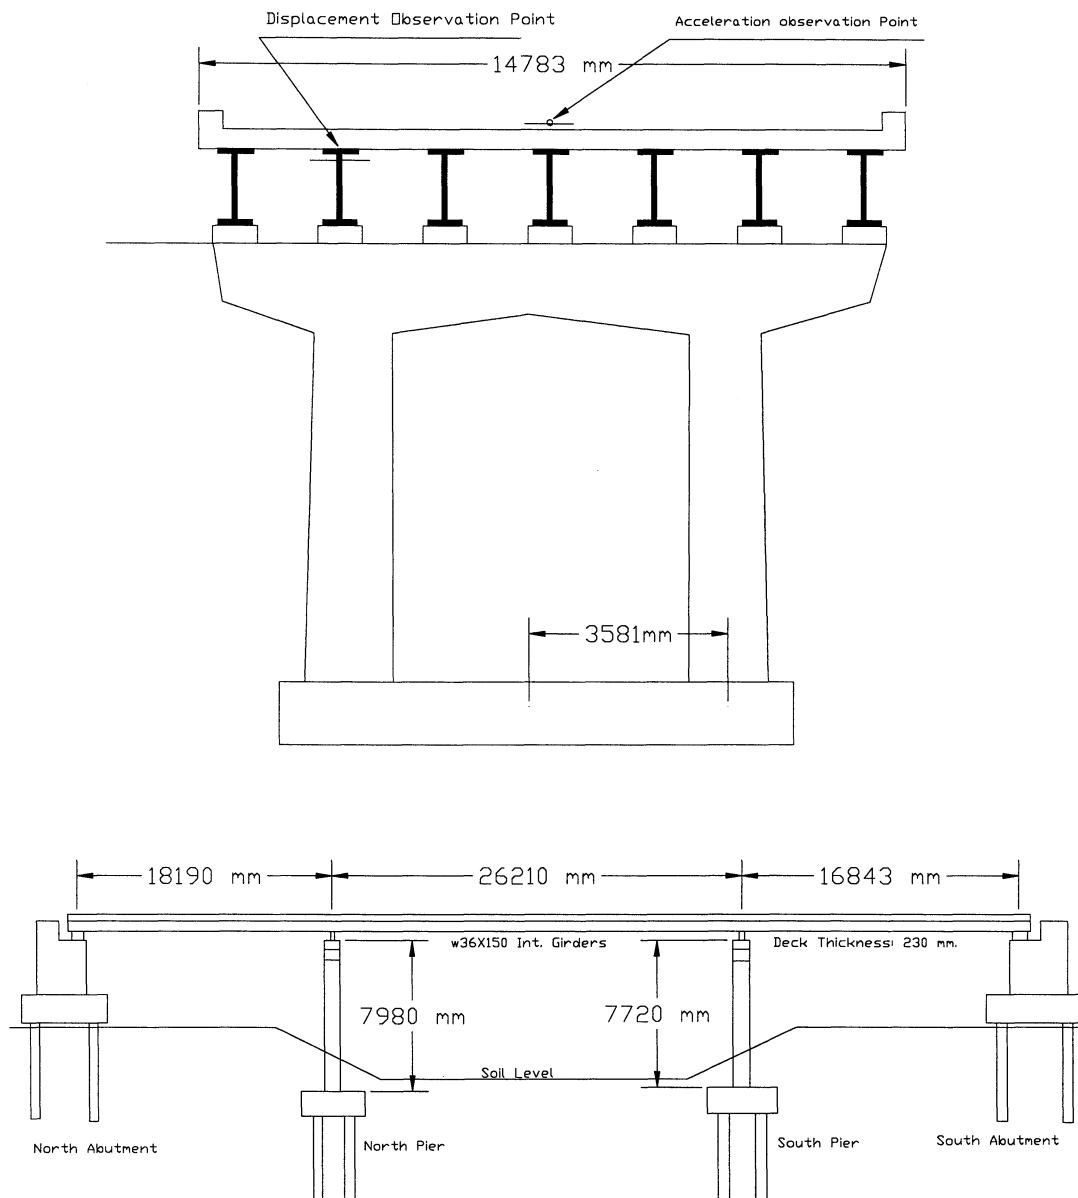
Plan and Side Views of Cazenovia Creek Bridge in New York State
